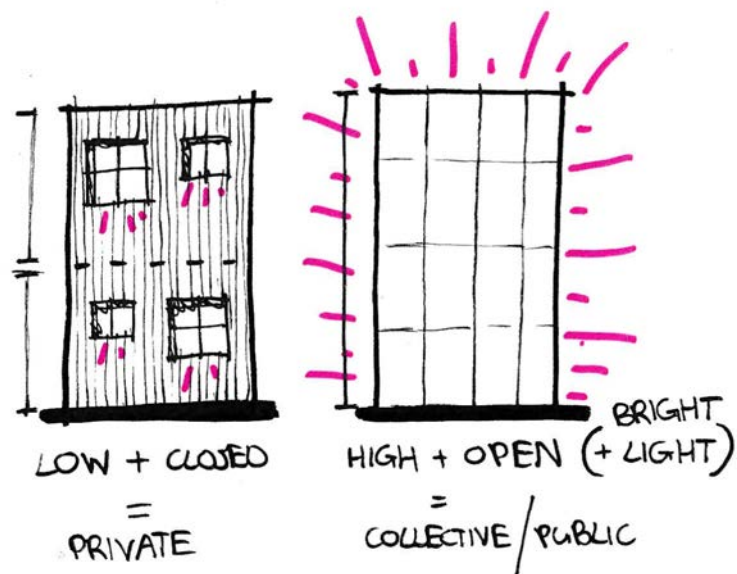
Closed façades used for private spaces; transparent façades for collective/public spaces (by author)
